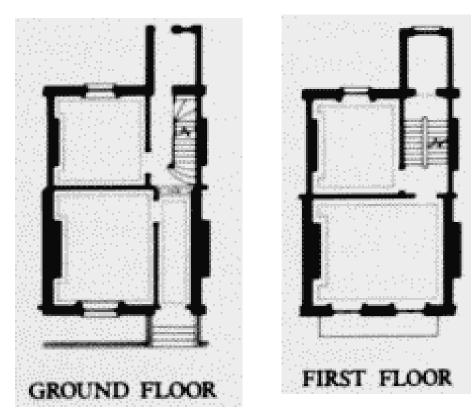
Typical plans for a 19th century terraced house from the Survey of London
